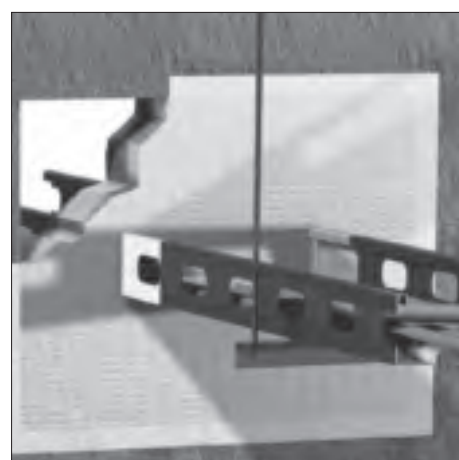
Typical example of sealing of services penetrating a wall.
